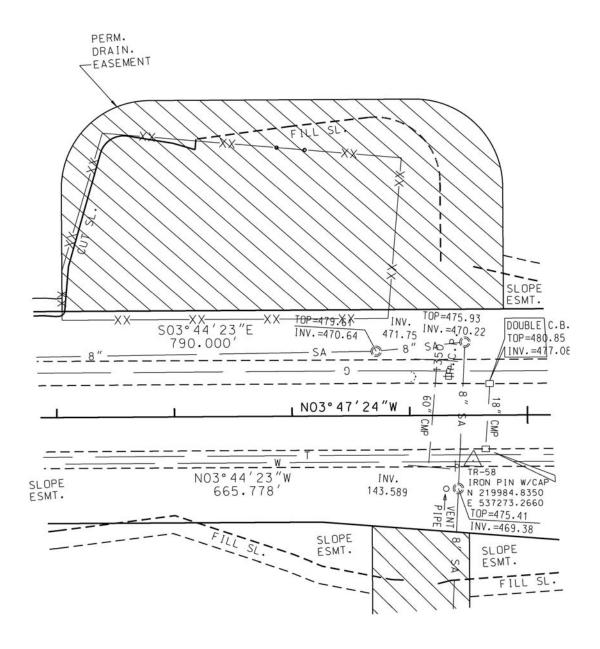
A-11. Portion of Present Layout Sheet (Detention System)
